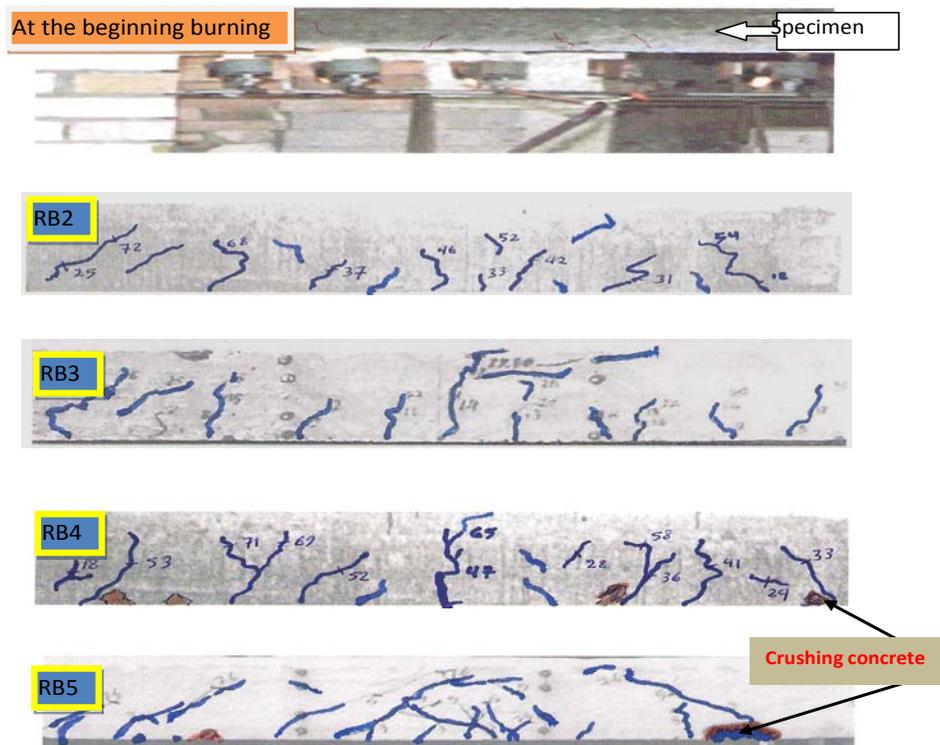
Typical crack pattern of rigid beam specimens before and after burning and subjected to loading.
